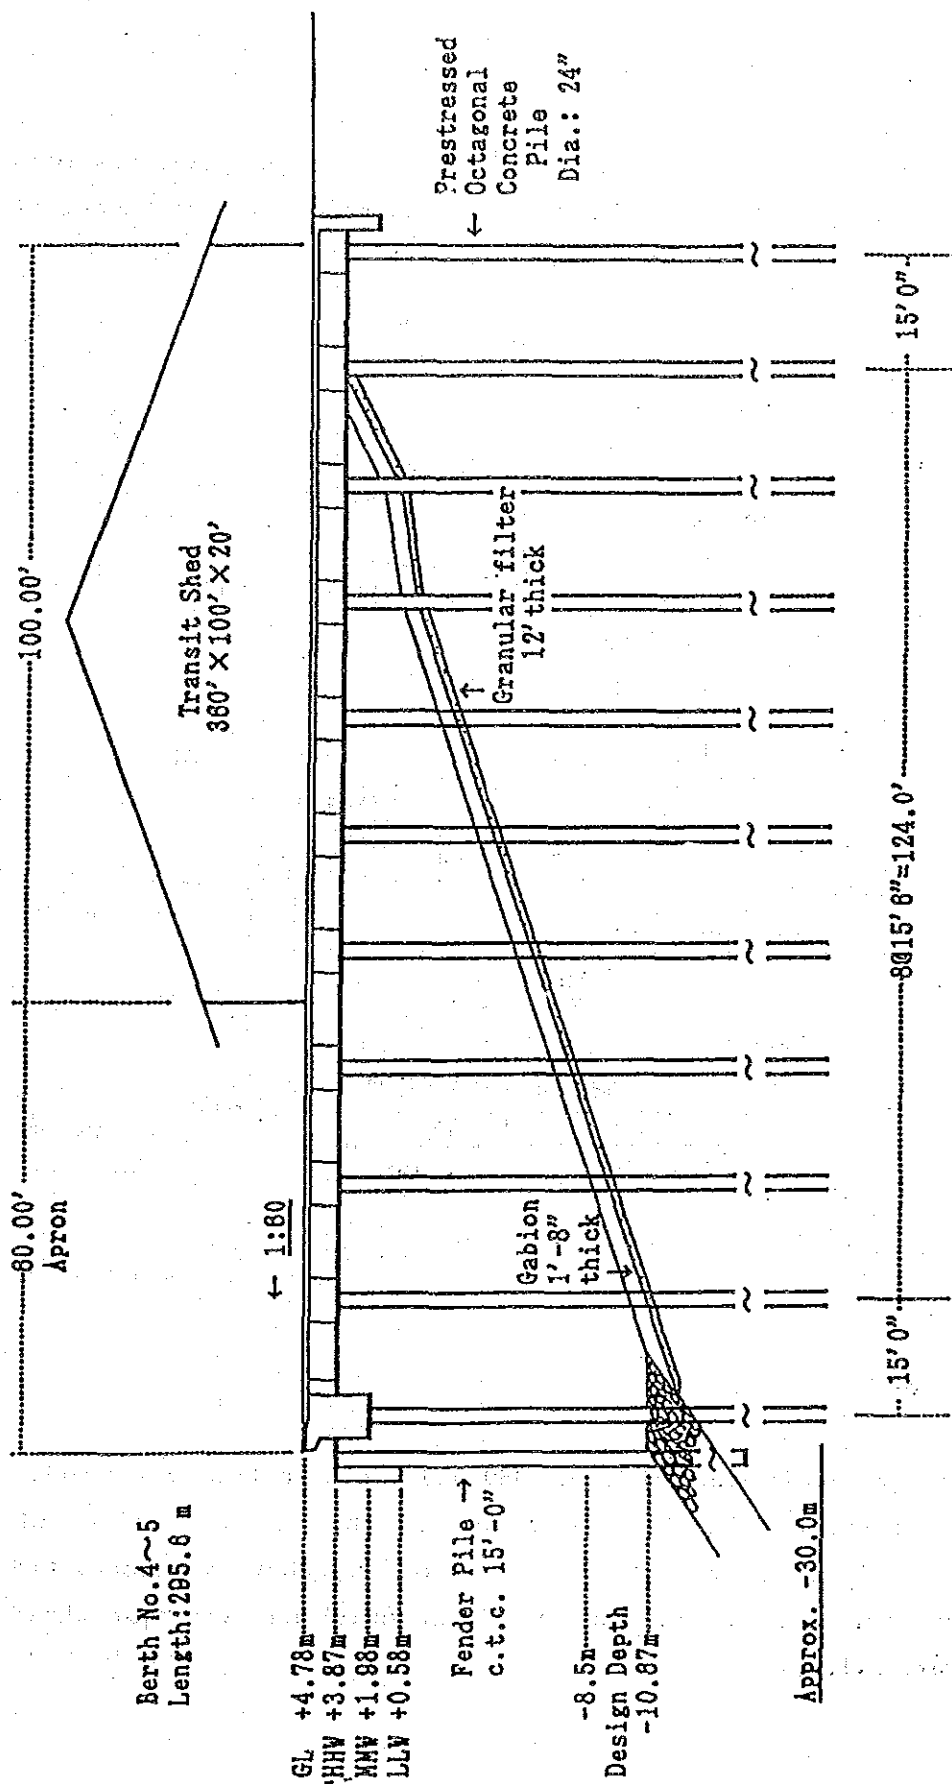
Typical Cross-Section of Existing New Wharf
